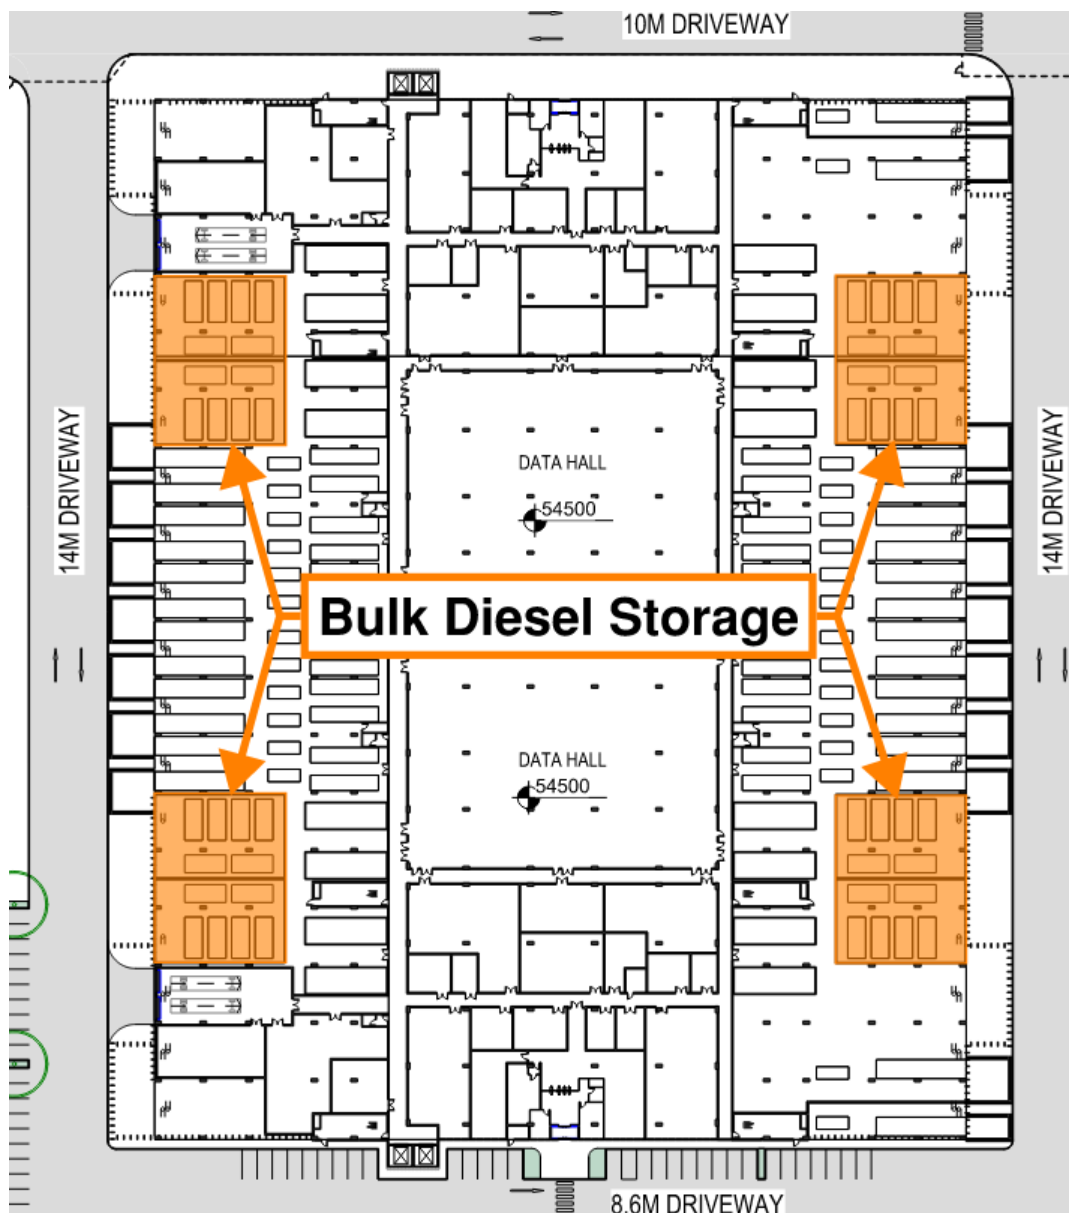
Location of Bulk Storage tanks – Ground Floor Data Hall Building – Typical Layout of All Buildings
